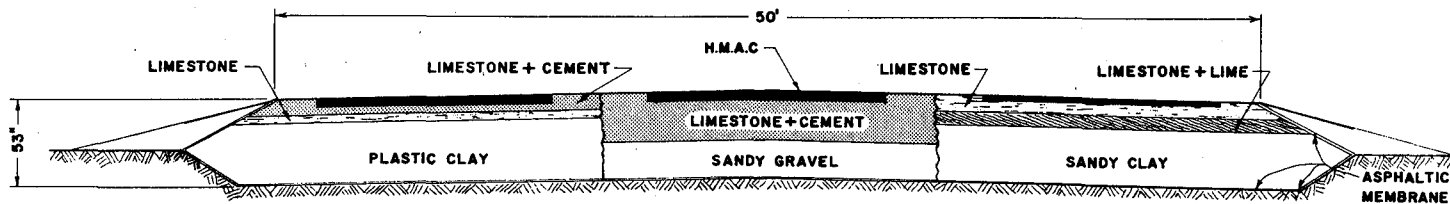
Cross-section of pavement test facility (Section A-A of Figure 4). Vertical distance from surface to foundation was held constant, thicknesses and materials between were varied as shown in Table 3.
